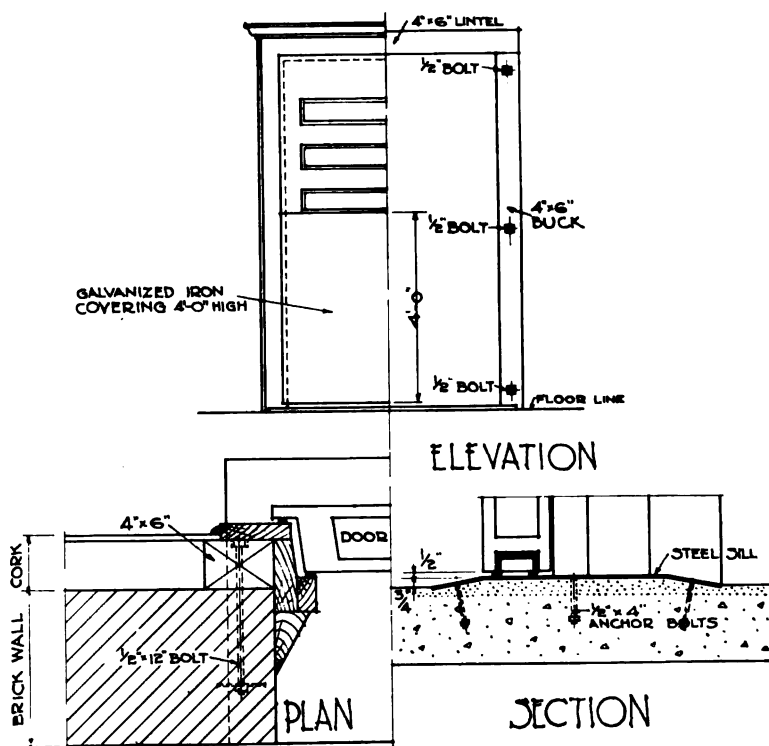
REFRIGERATOR DOOR IN BRICK WALL.
